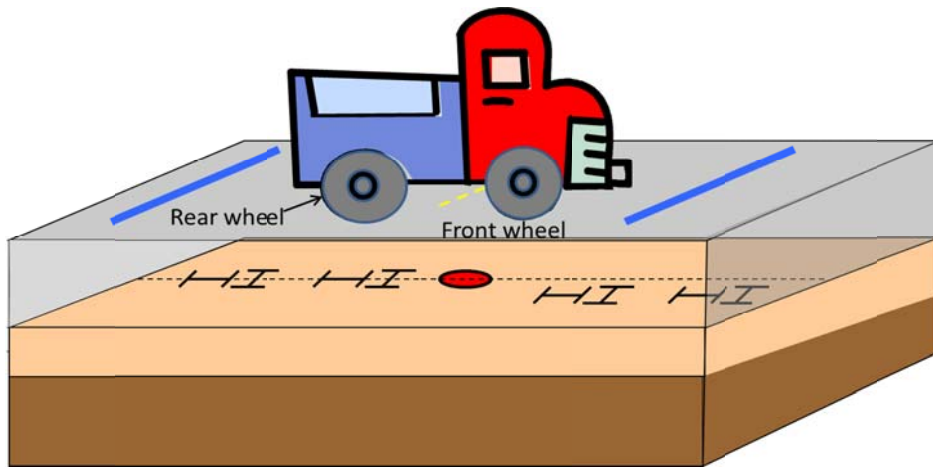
Schematic drawing showing a truck passing over an instrumented pavement section.
